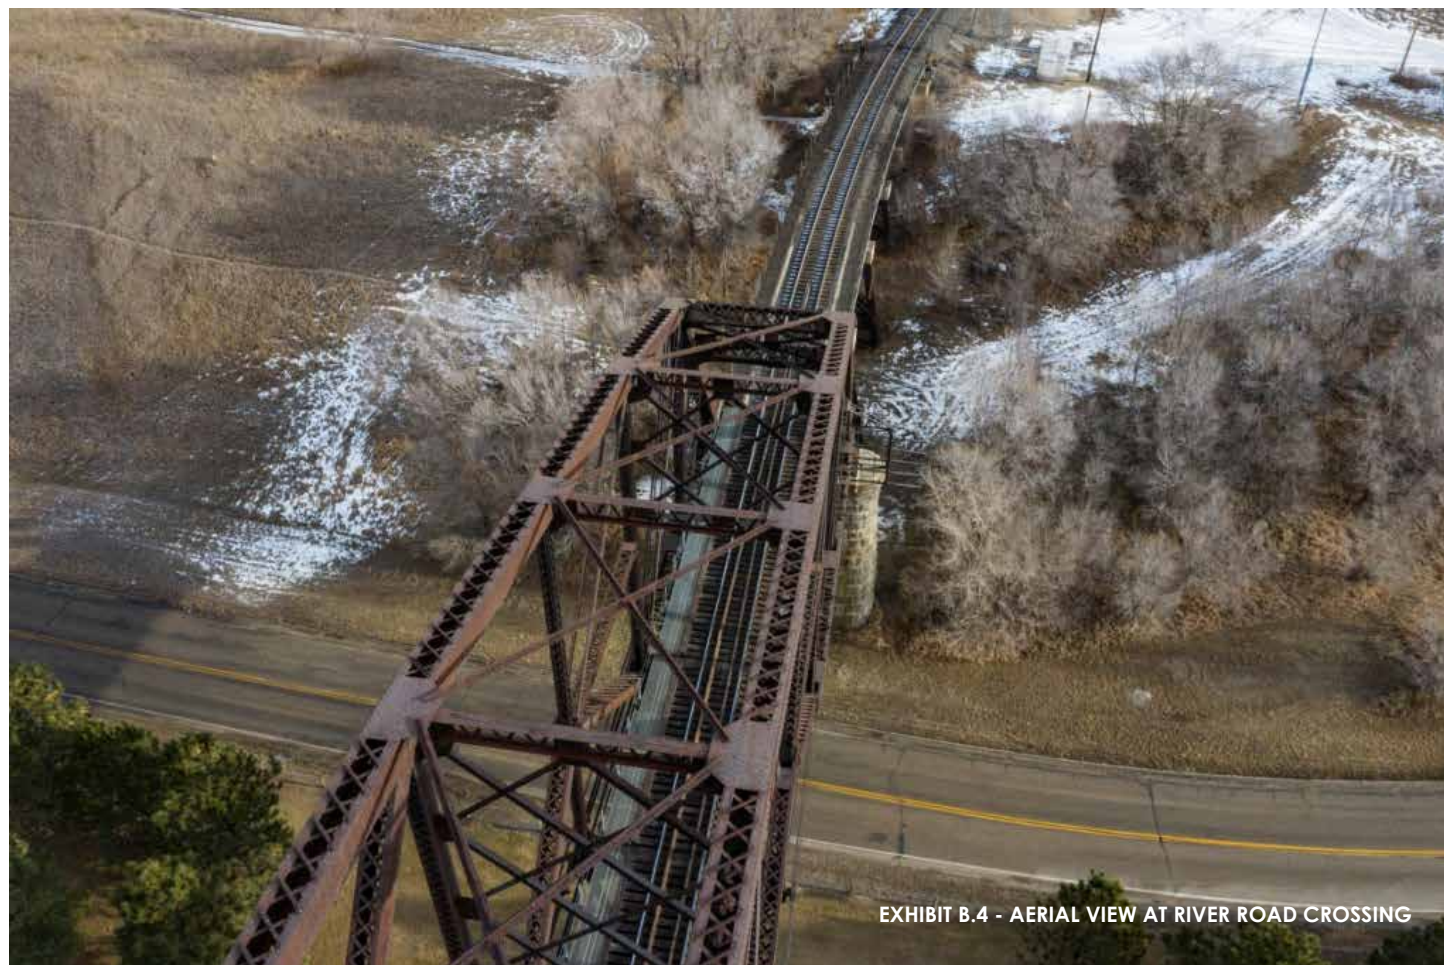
AERIAL VIEW AT RIVER ROAD CROSSING
